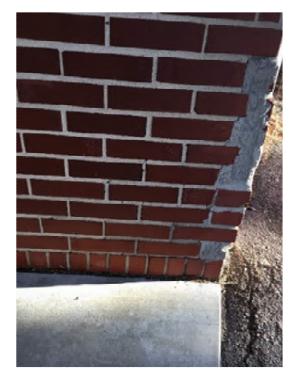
Significant deterioration of masonry veneer on building's west elevation.
